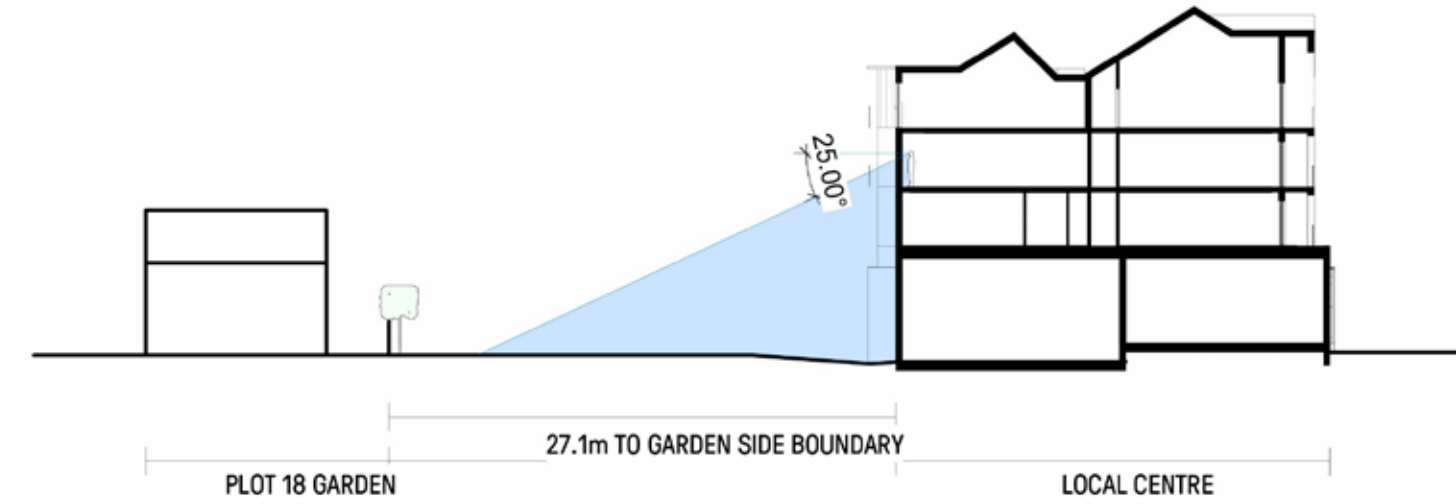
Local Centre & Plot 18 Second Floor Privacy Section prepared for Design Workshop
